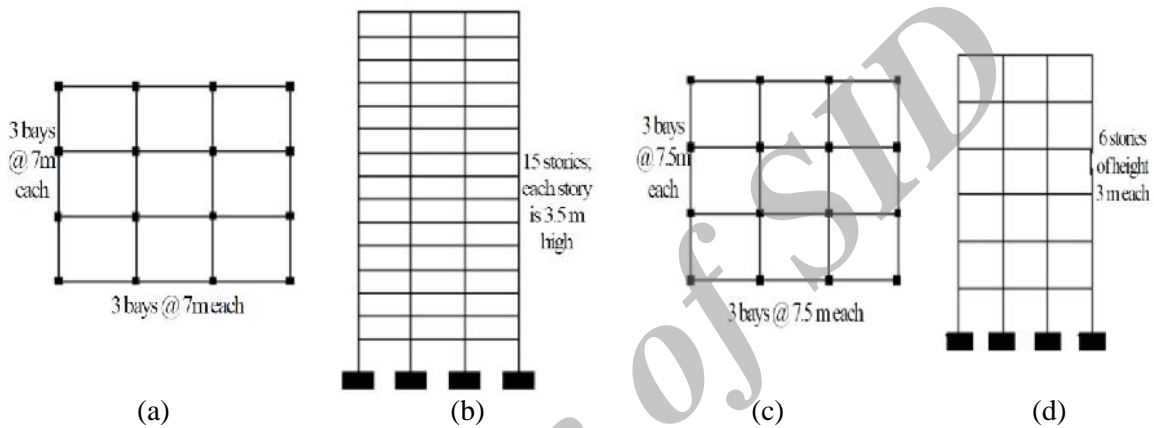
Plan and elevation of buildings B1 and B2 (a) Plan of B1 (b) Elevation of B1 (c) Plan of B2 (d) Elevation of B2
